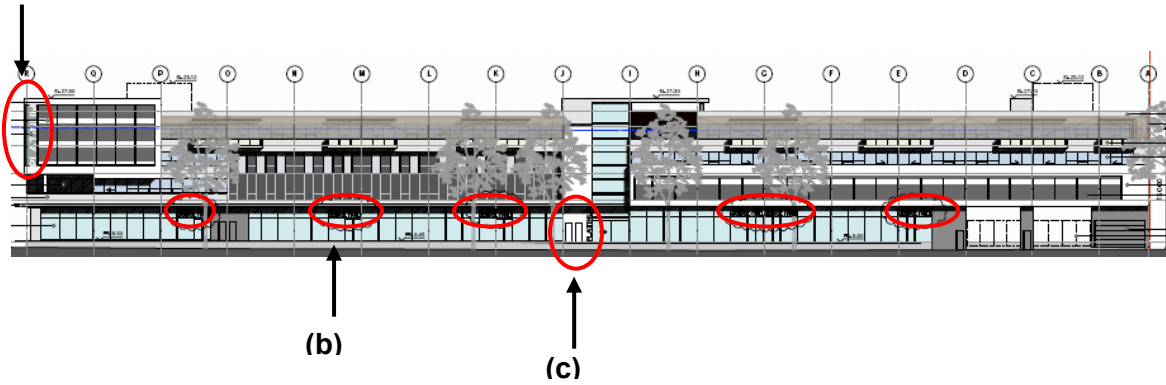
North west elevation – Bourke Road showing ground level hamper signage zones and vertically projecting wall signage.
